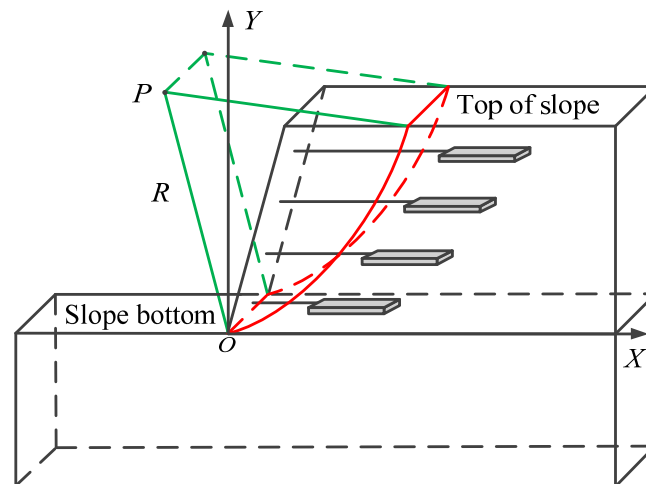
Section view of a frame with a prestressed anchor-plate supporting structure.
